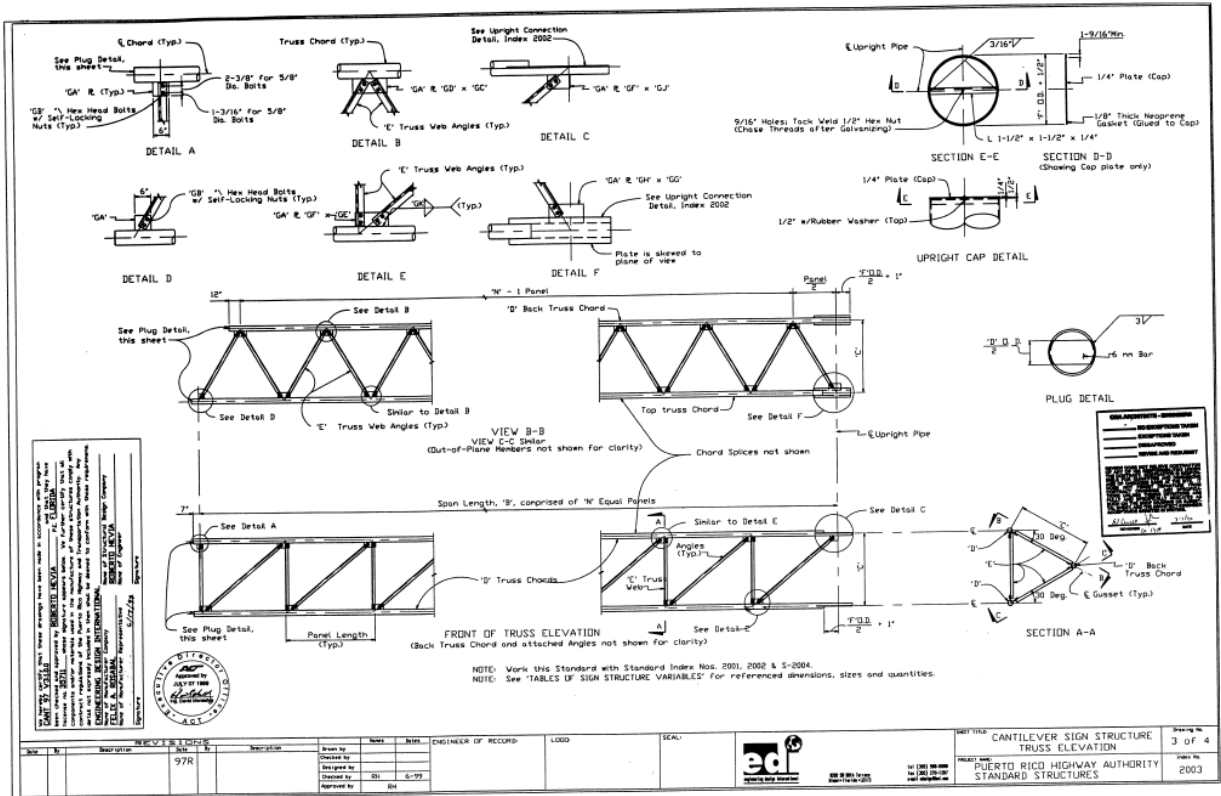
Overhead Cantilever Traffic Sign - Truss Arm Elevations (PRHTA, 2010)
